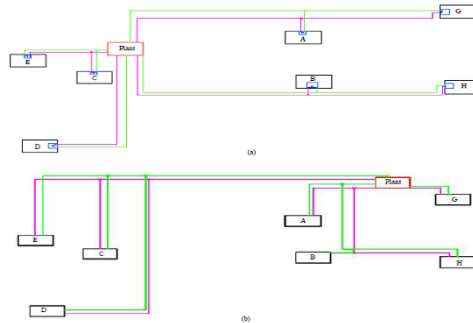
District cooling system schematic layout for the two locations selected: (a) near building E and (b) between buildings A&G ; where the red box is representing the district cooling plant, black boxes for the serviced buildings, purple lines for supply chilled water pipes and green lines for the return chilled water pipes. The blue lines in (a) is for the thermal bridge representation at each building where heat transfer occurs between the primary and secondary chilled water systems
